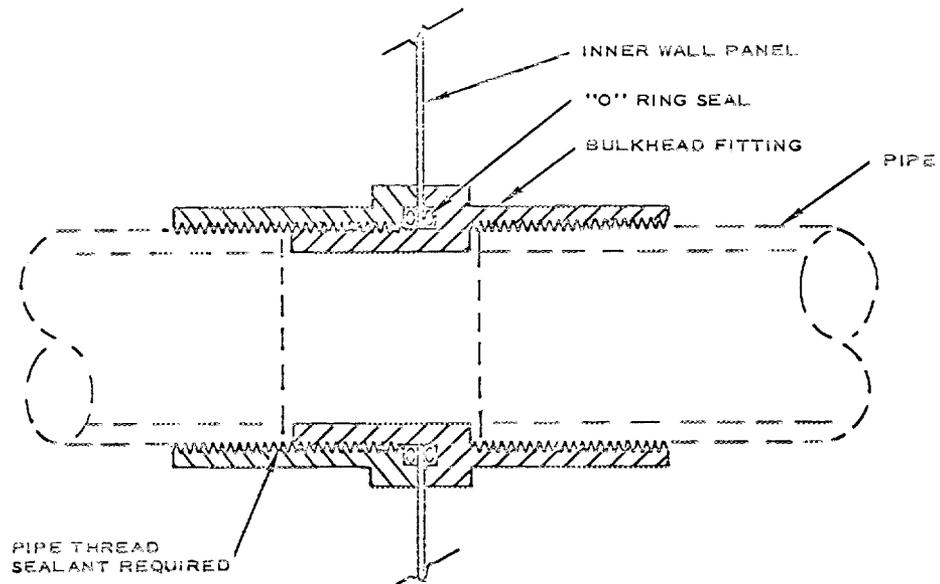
Piping Penetration in Metal Panel Wall. (From ref. 2)
